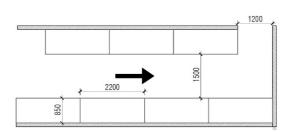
Minimum dimensions for parallel motorbike parking two -way
